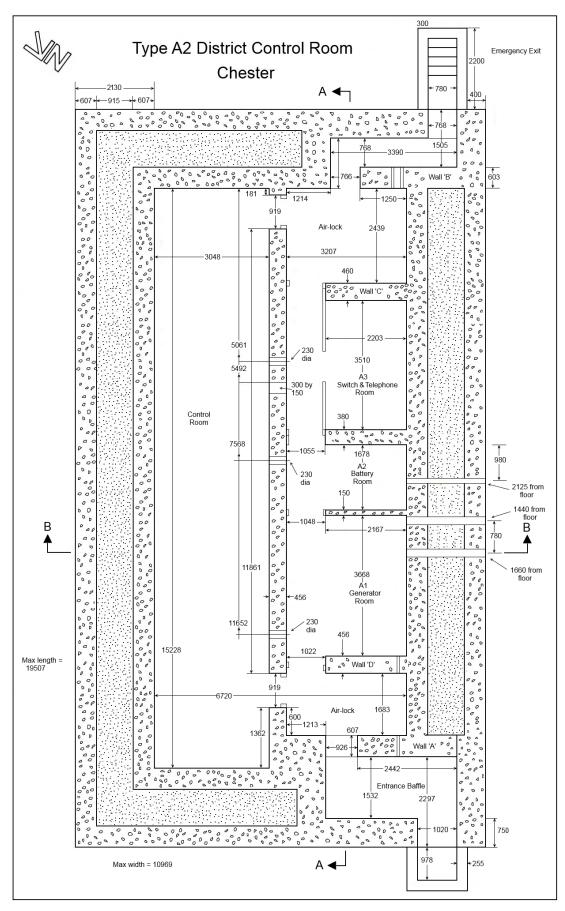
Plan of the Chester District type A2 building with metric dimensions Surveyed on 16 December 2013
